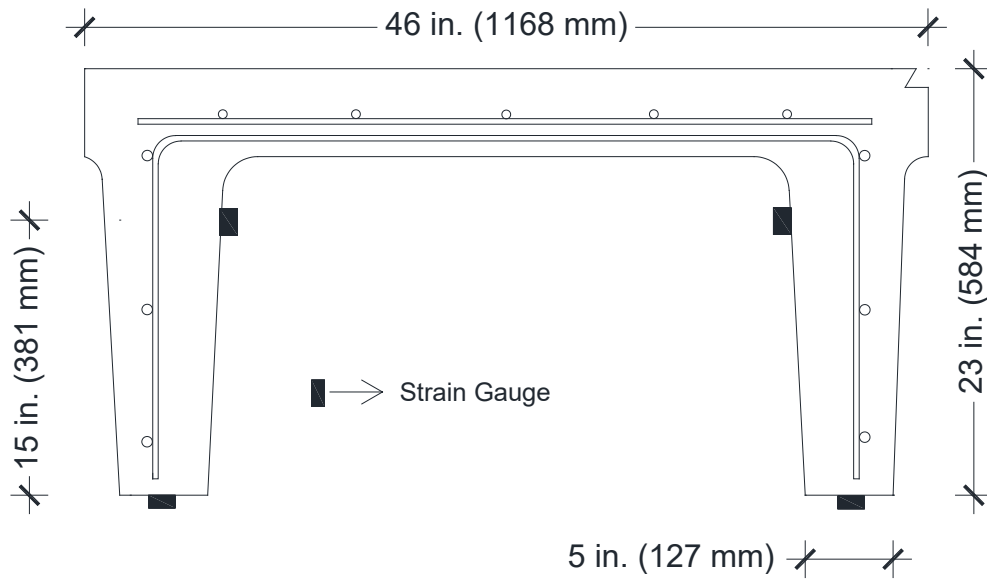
Girder Strain Gauge Instrumentation Plan for Flexural Response of 23-in. (584-mm) Deep Double-Tee Girder Bridge – Section View
